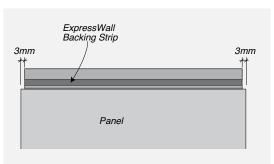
Horizontal Joint with ExpressWall Backing Strip
